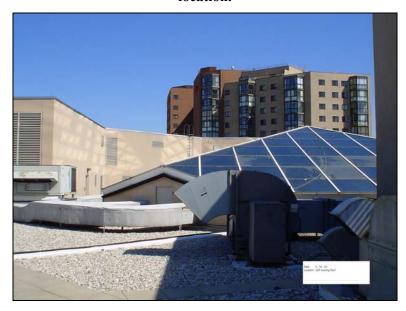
Building exhaust fan located approximately 20 feet from the collection antenna at the NSF location.
